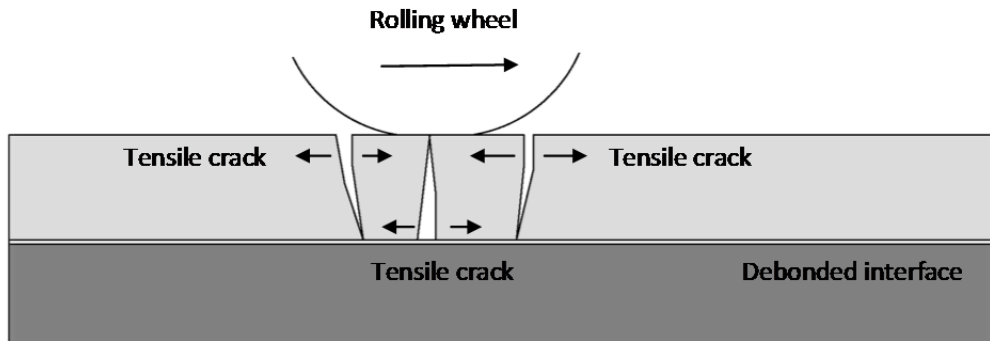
Schematic tensile cracks in debonded surface layer due to rolling wheel.
